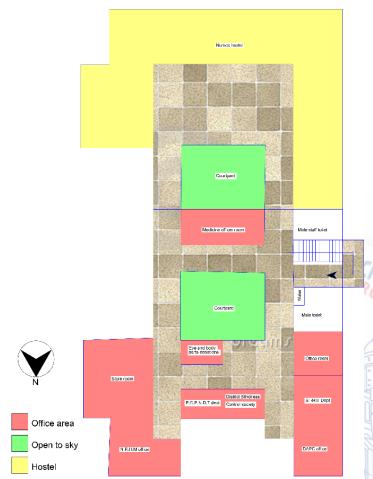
SECOND FLOOR PLAN. CIVIL HOSPITAL ALIBAG
